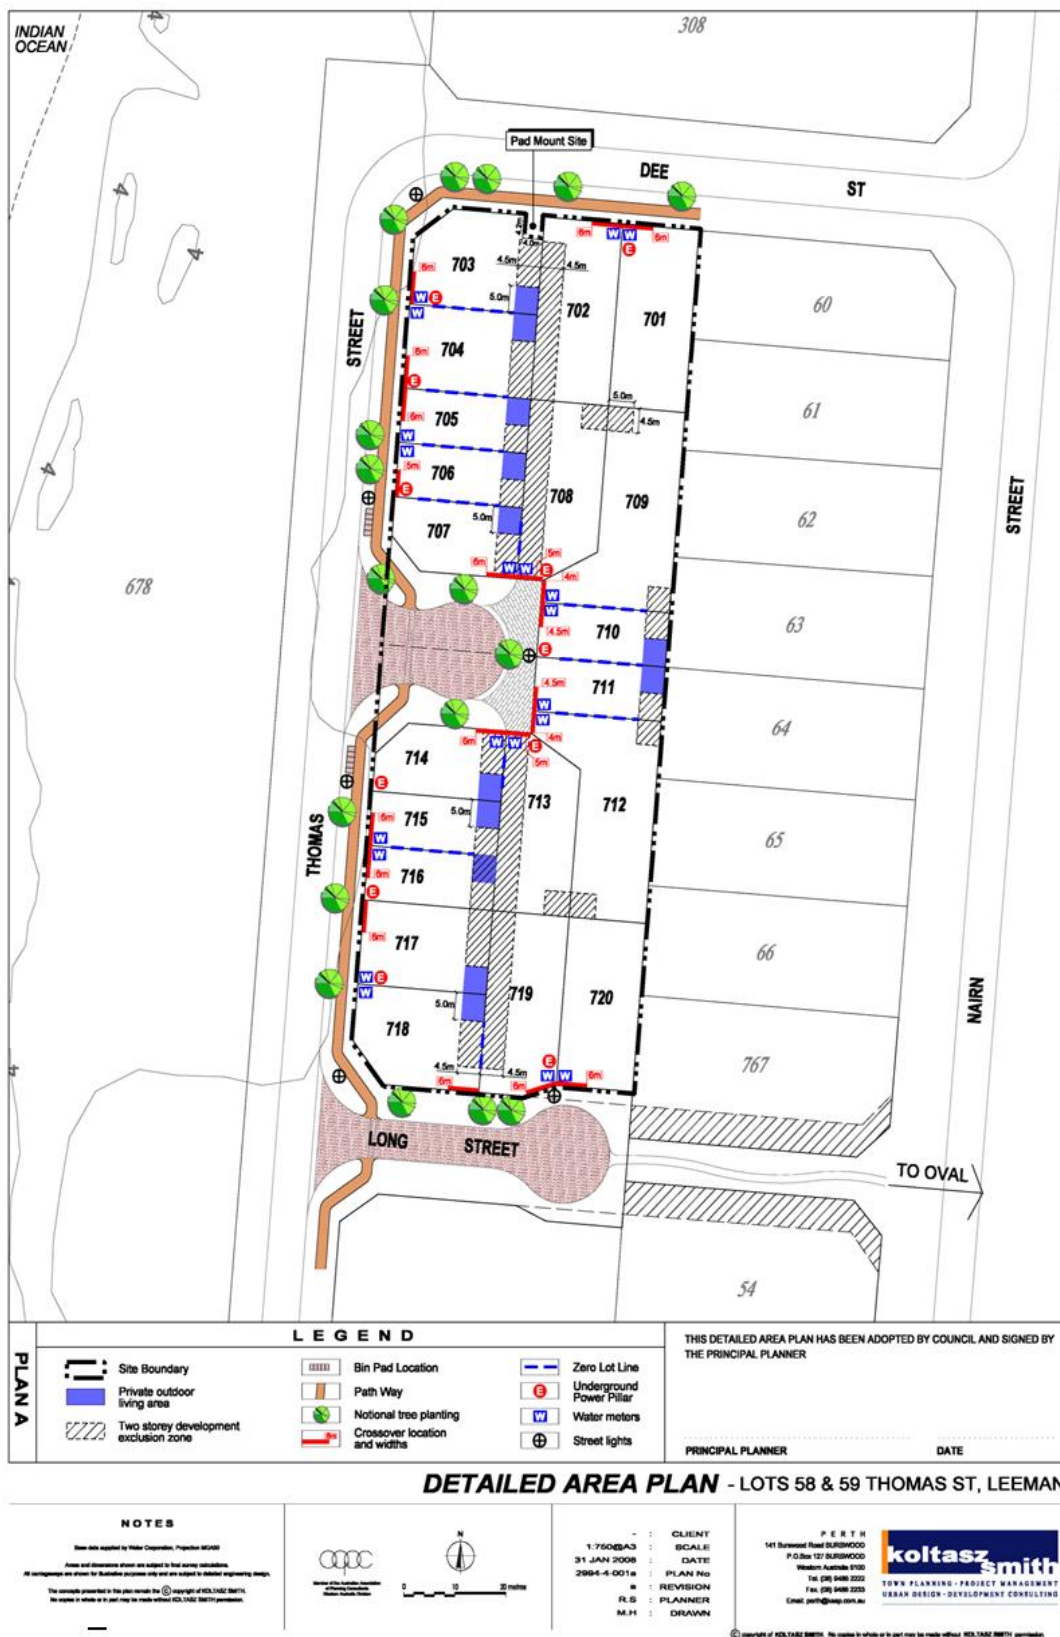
## DETAILED AREA PLAN Lots 58 & 59 Thomas Street, LEEMAN
